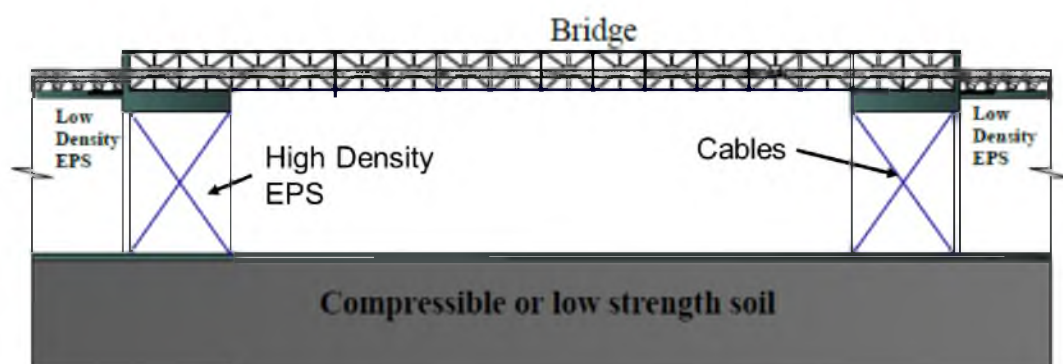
Bridge support system with rectangular prismatic shape EPS embankment
